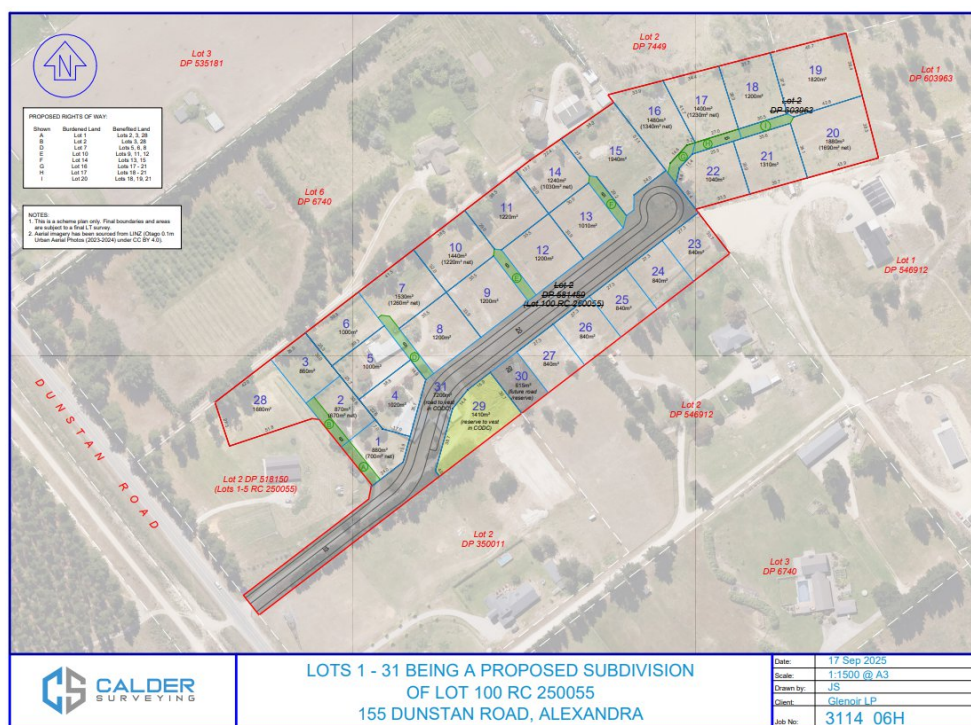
Proposed subdivision of 155 & 157 Dunstan Road (Source: Amended application, 2025)
